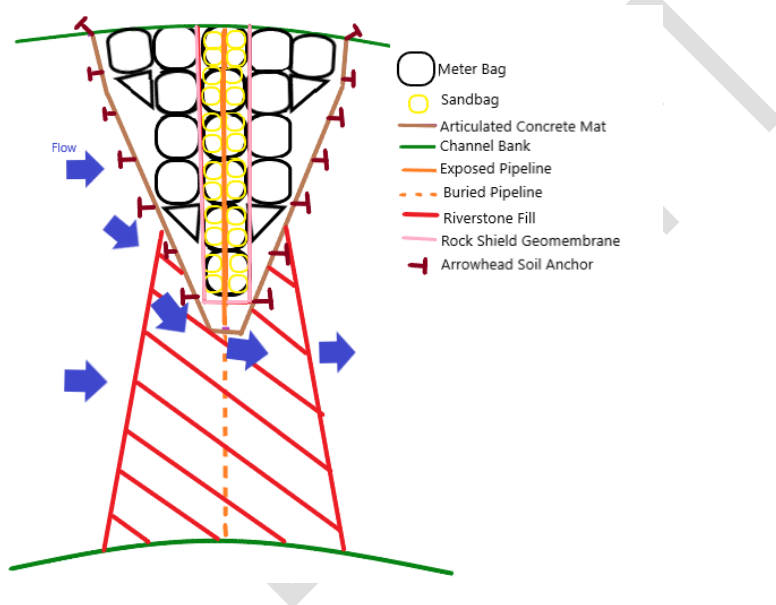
Meter Bag and Articulated Concrete Matting Temporary Mitigation Plan View
